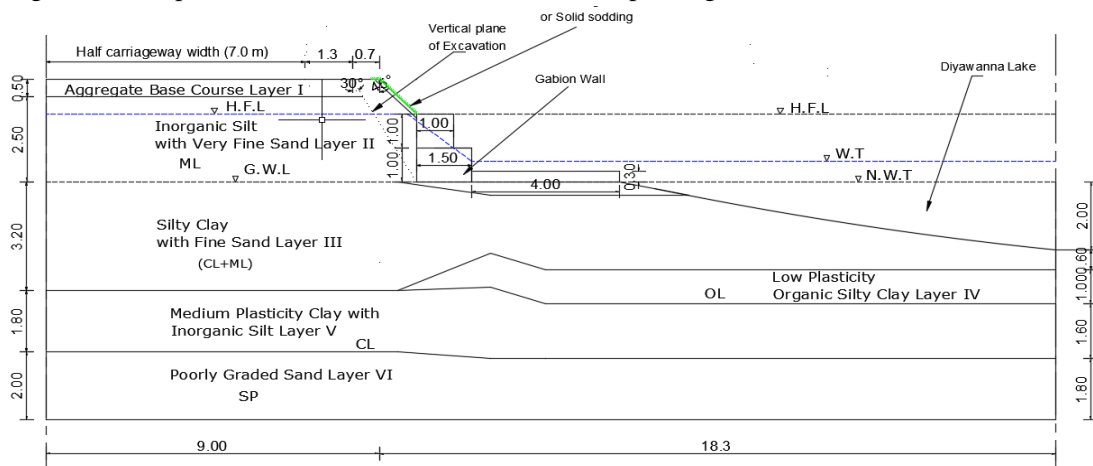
Proposed Gabion Wall at the toe, Reinforced with Solid Sodding
